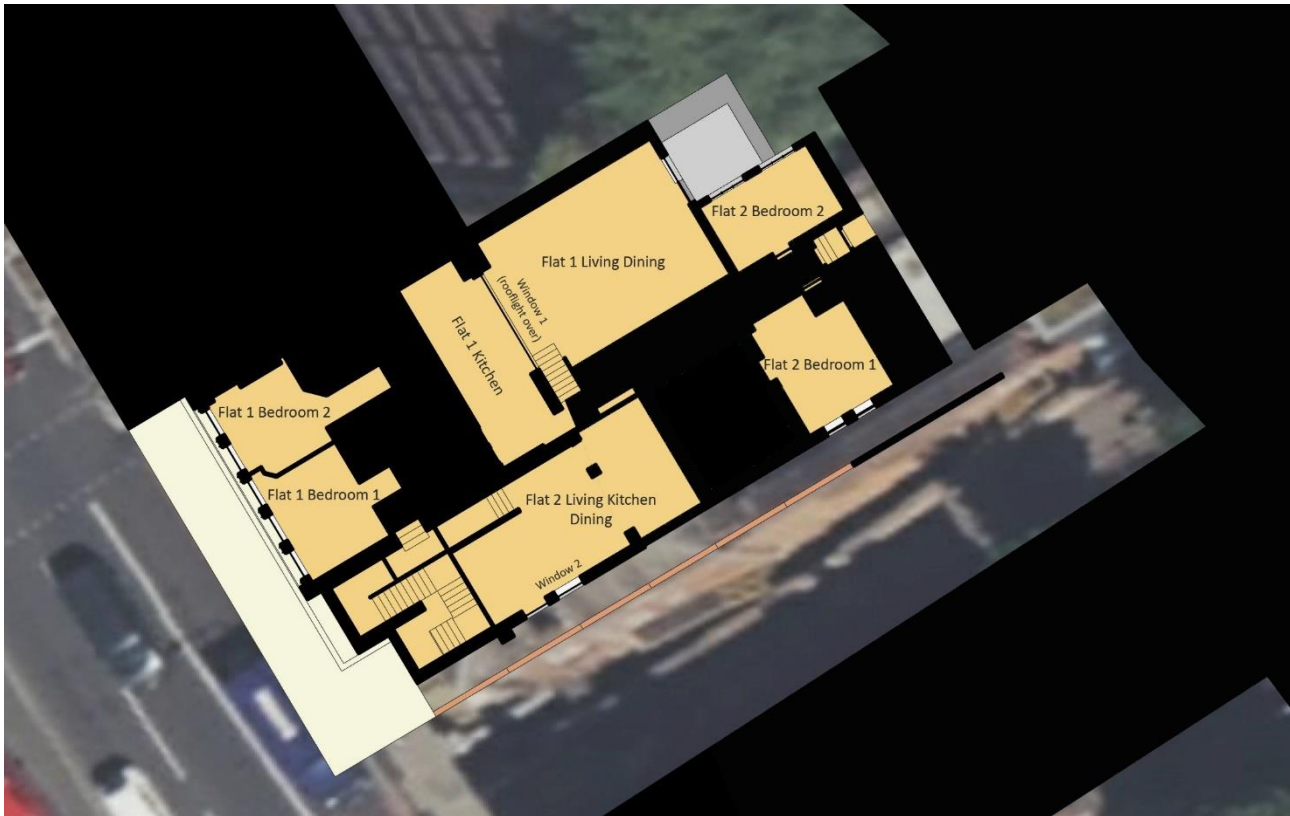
Section cut through proposed first floor with habitable rooms tested for daylight and living room windows tested for sunlight labelled. North to top.
